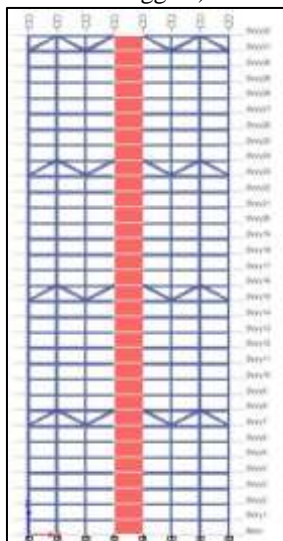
Sectional Elevation of Building Model 4 (With Inv. V Outriggers)
